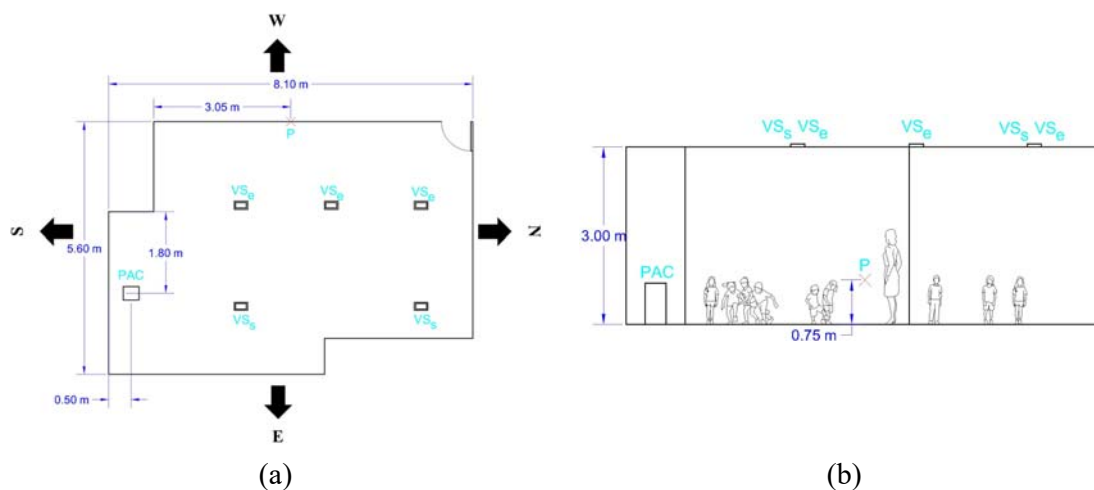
Experimental classroom setup: (a) Plan view (b) Elevation view.
